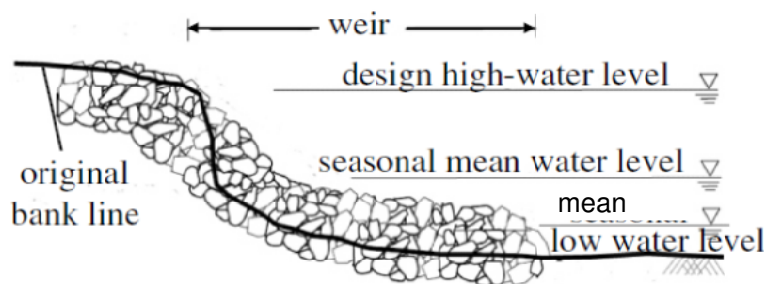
Bendway weir (Lagasse et al. 2009)
